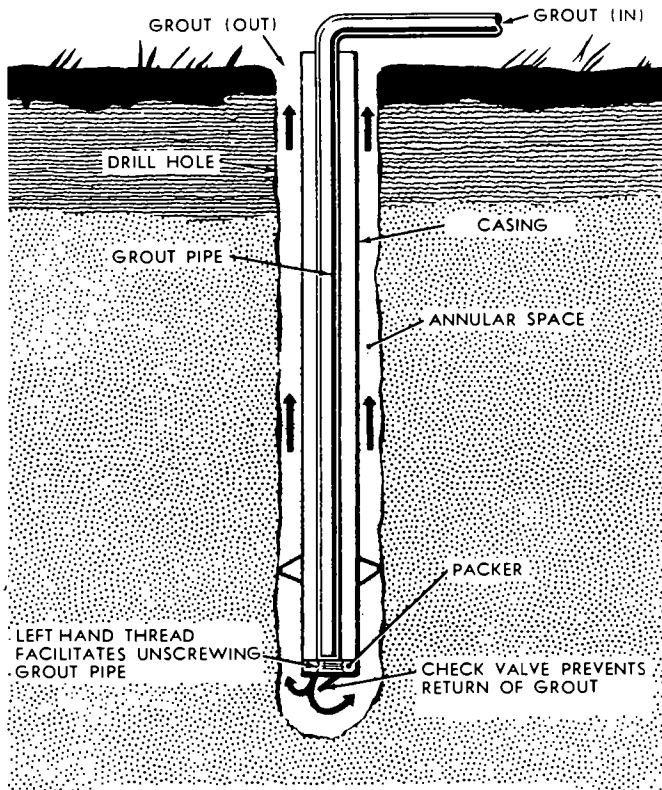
Arrangement for placing cement grout through casing pipe.
